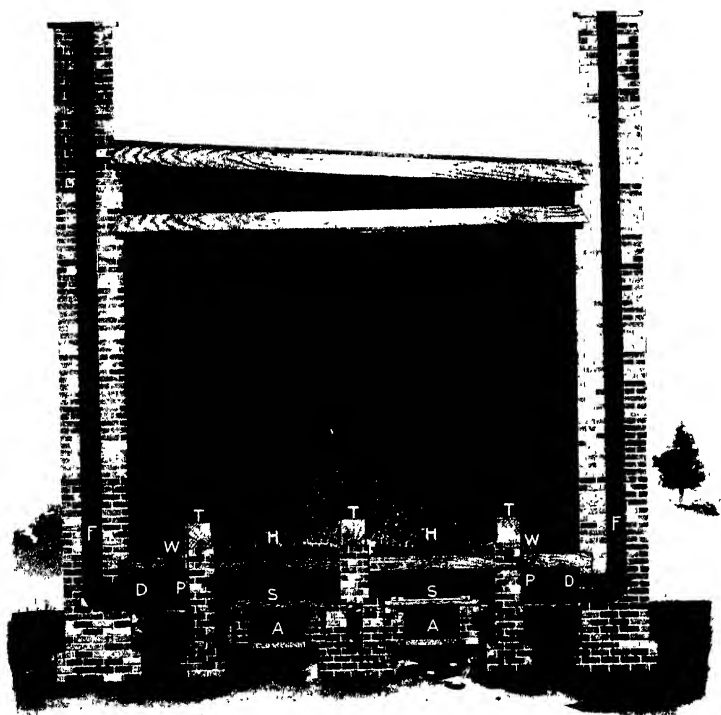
Cross section of a ventilated type of kiln. (Courtesy of American Blower Co.)
